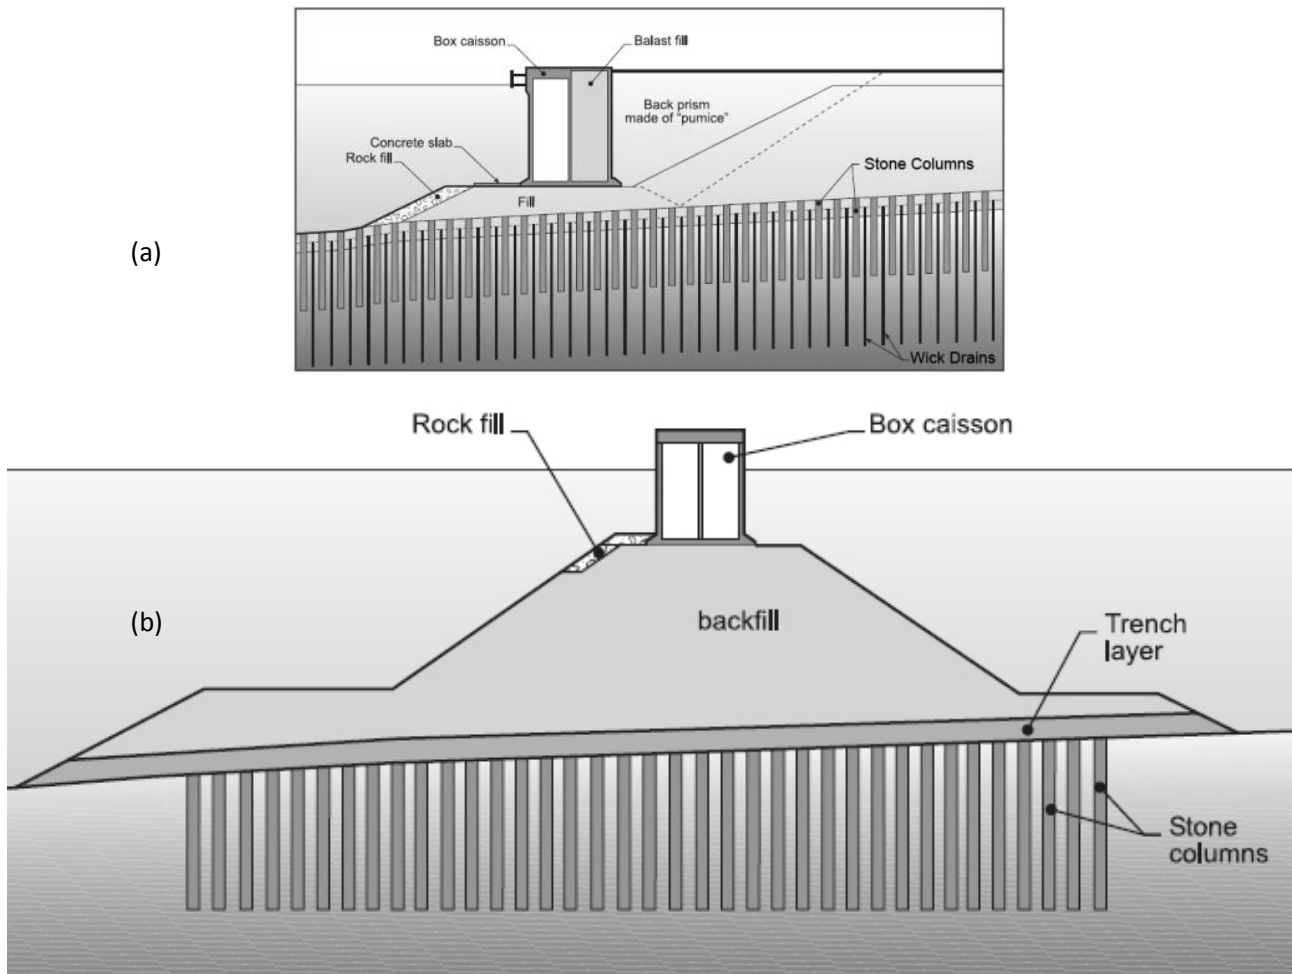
Typical cross sections of (a) the quay wall and (b) the breakwater
